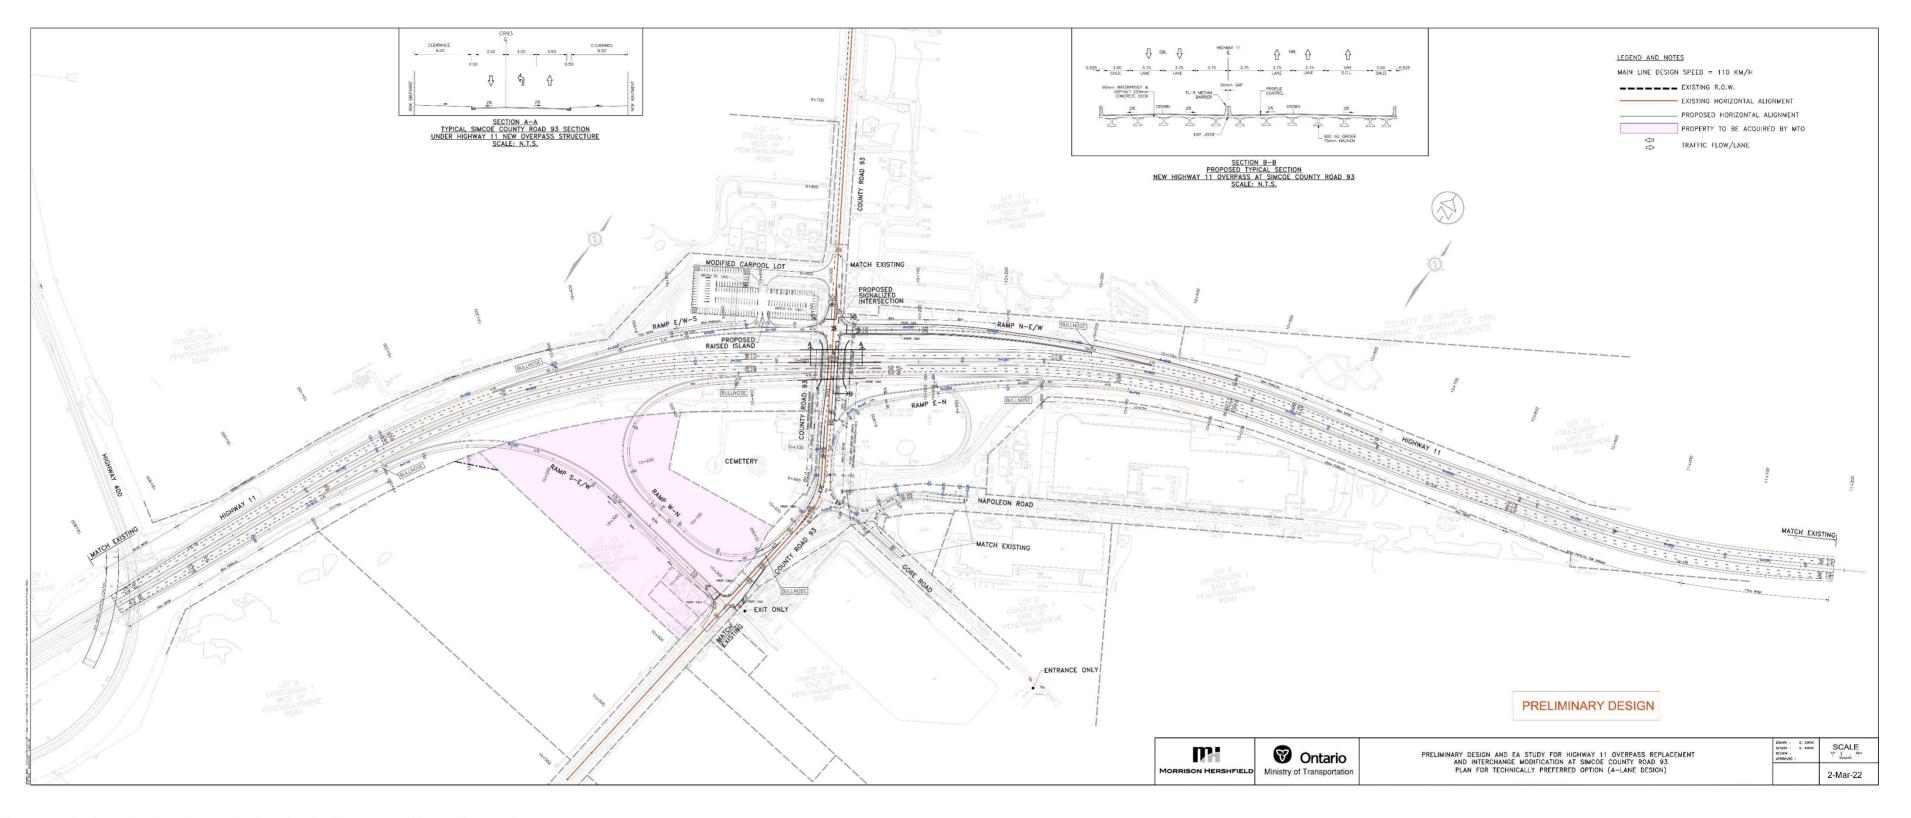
Preferred Design Alternative Plan for the Highway 11/Simcoe County Road 93 Interchange
